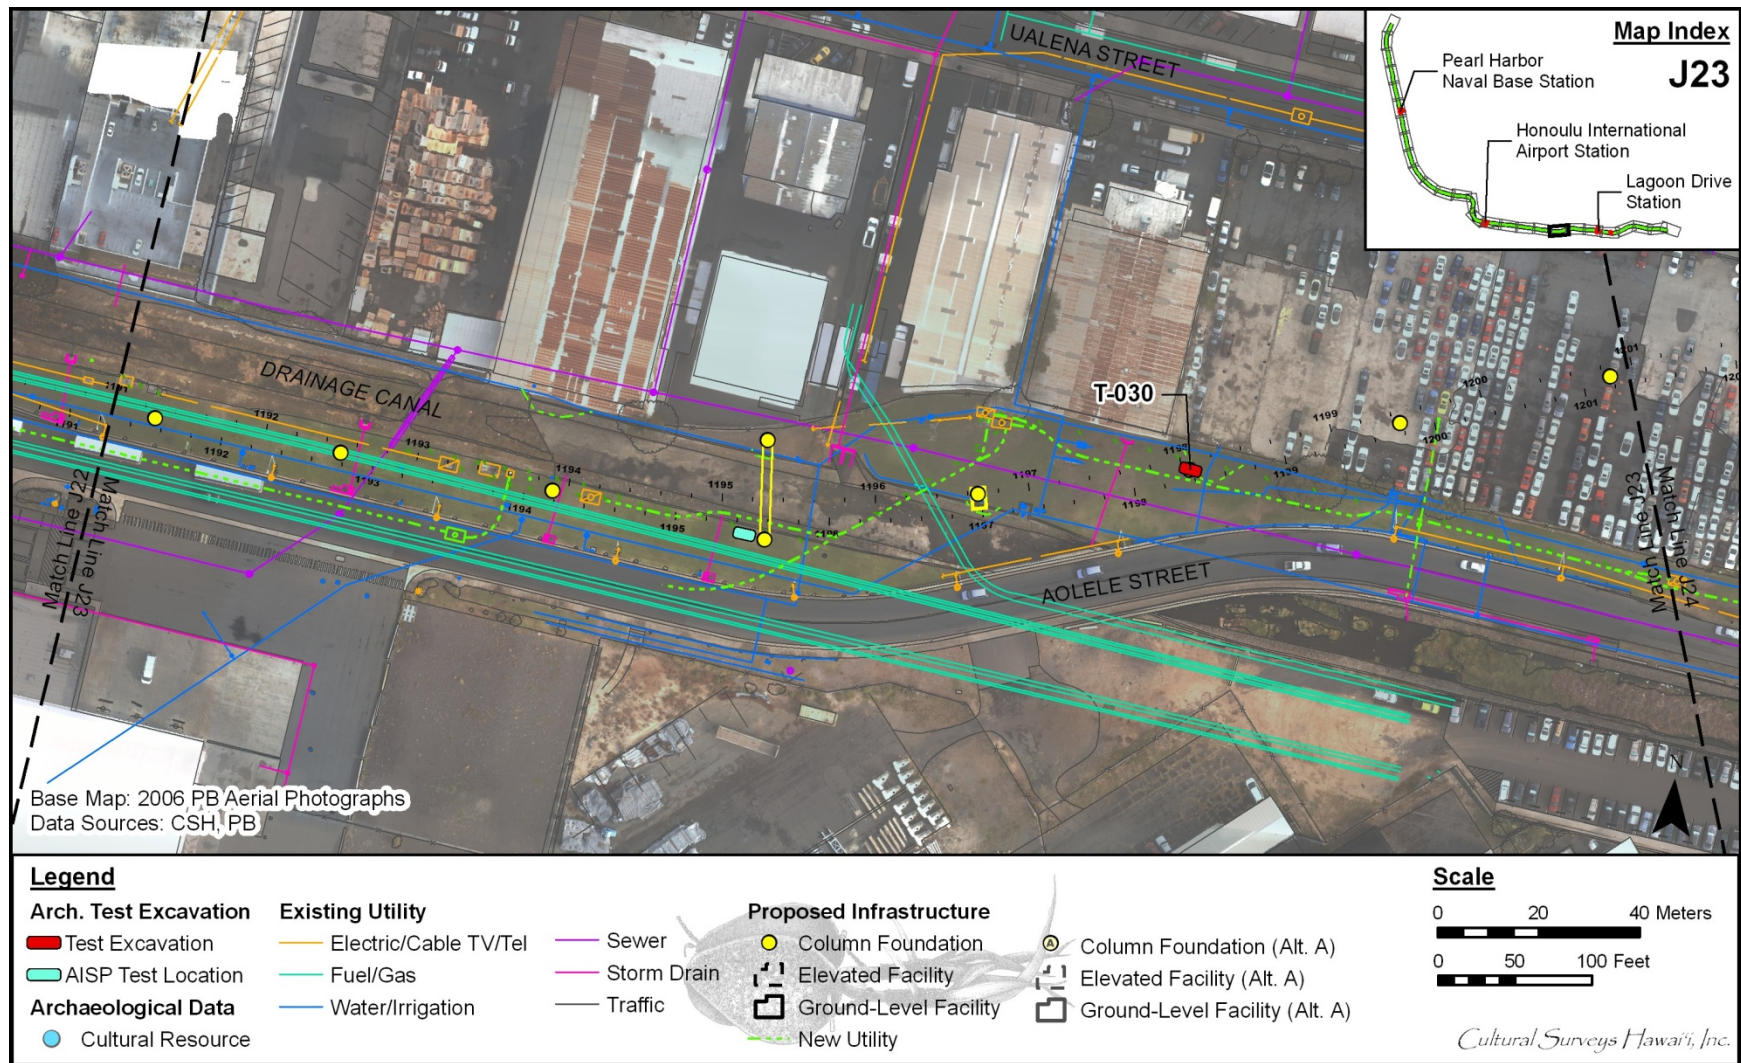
Map Sheet J23, one test excavation (T-030) at (*makai*) column foundation @ 1184+20
